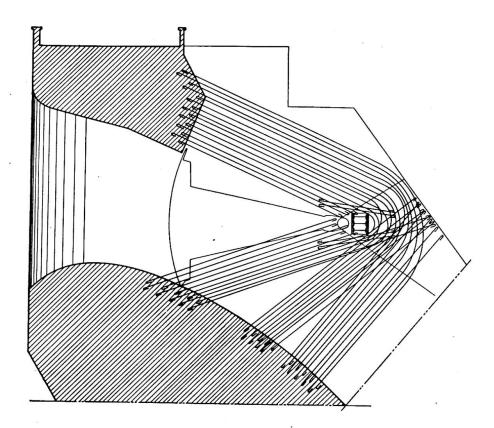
Reinforcement in the guide wall designed from the photoelastic test
